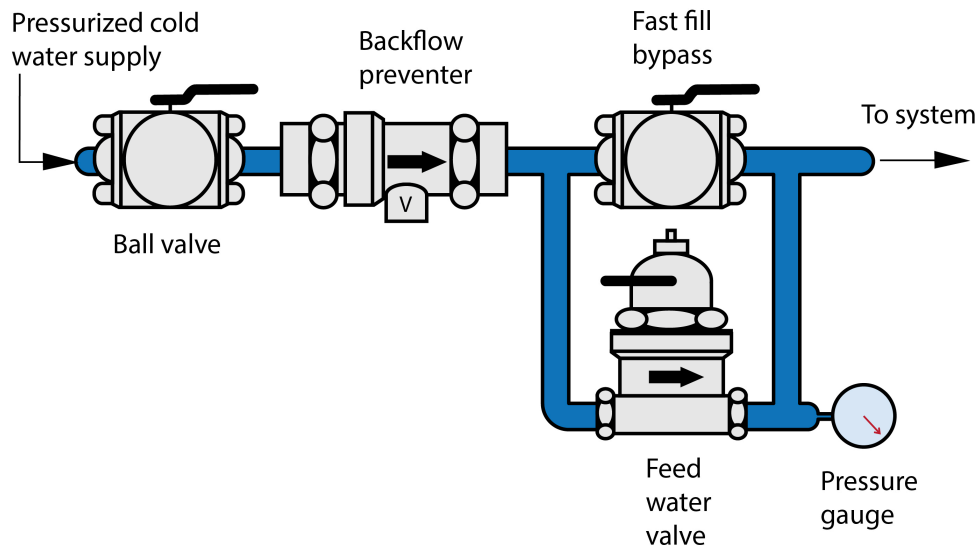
Quick fill bypass arrangement. (TRU Open Press,) CC BY-NC-SA
